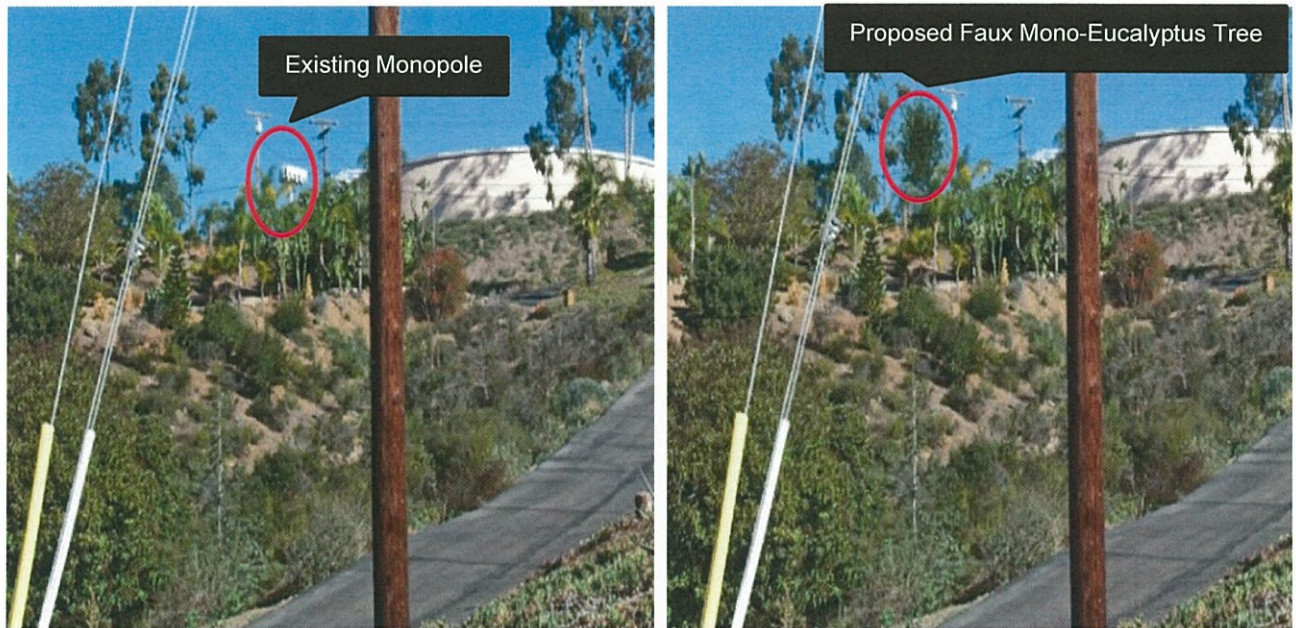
View of existing site (left) and proposed facility (right) looking northeast from Edgehill Road.
